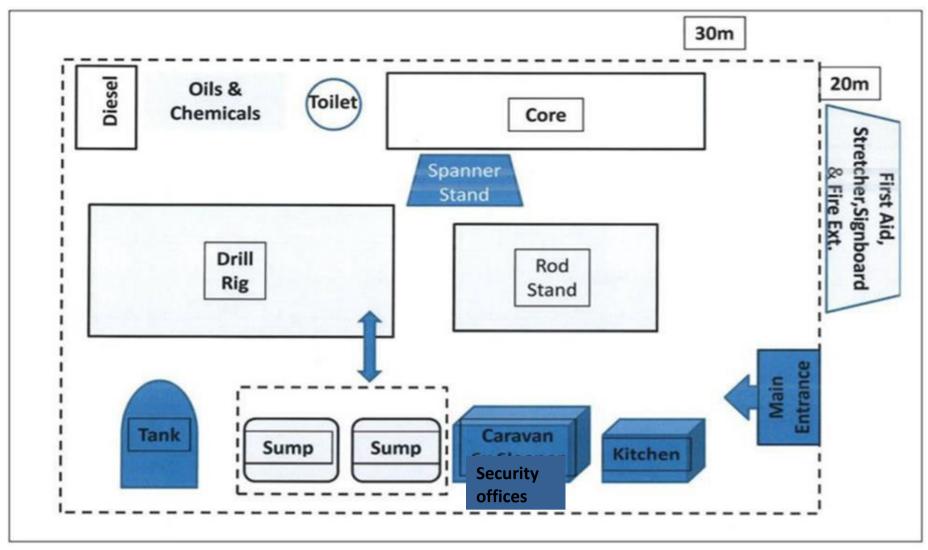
Layout plan showing the facilities to be placed on the proposed site
